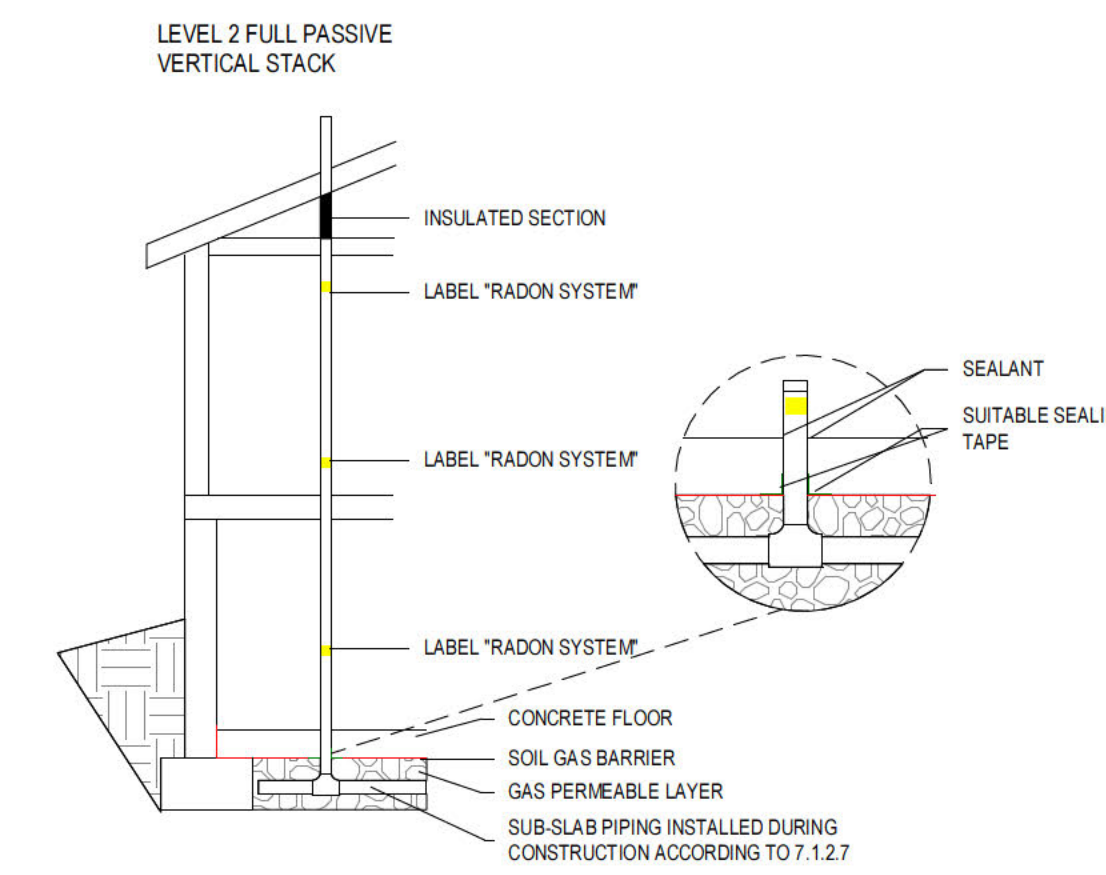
LEVEL 2 - FULL PASSIVE RADON STACK
